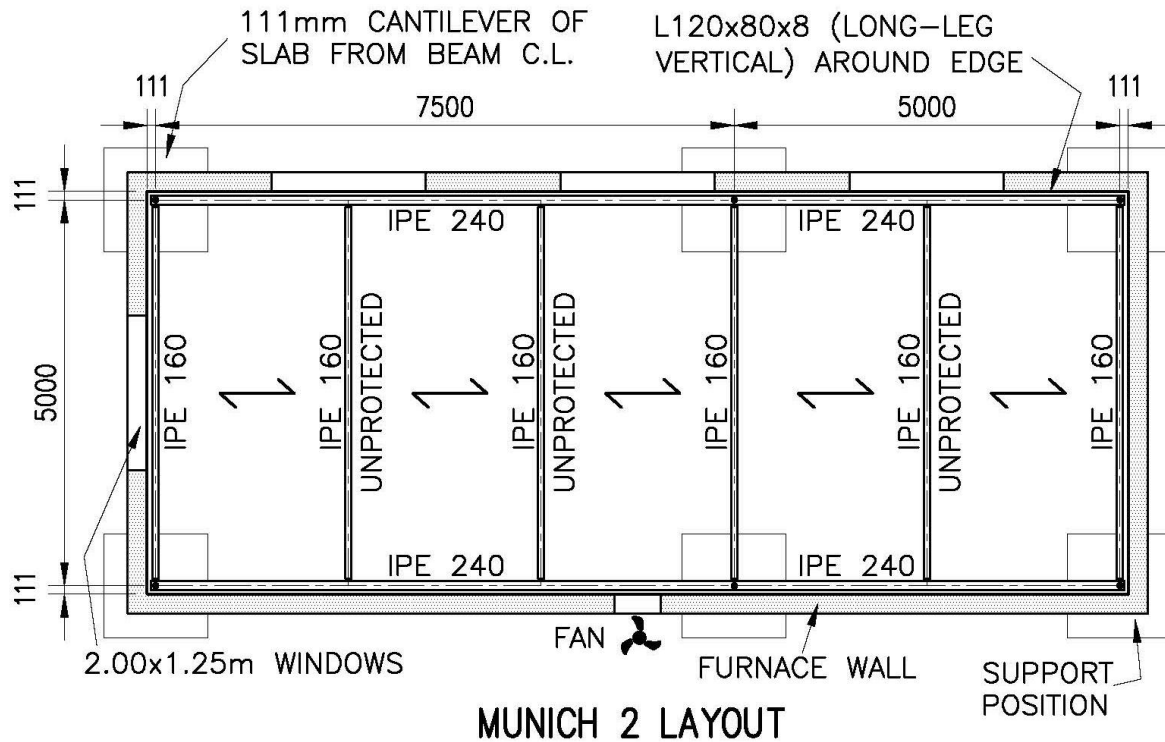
The Second Munich Test layout and the details of the composite slab and edge (Walls, 2016)
